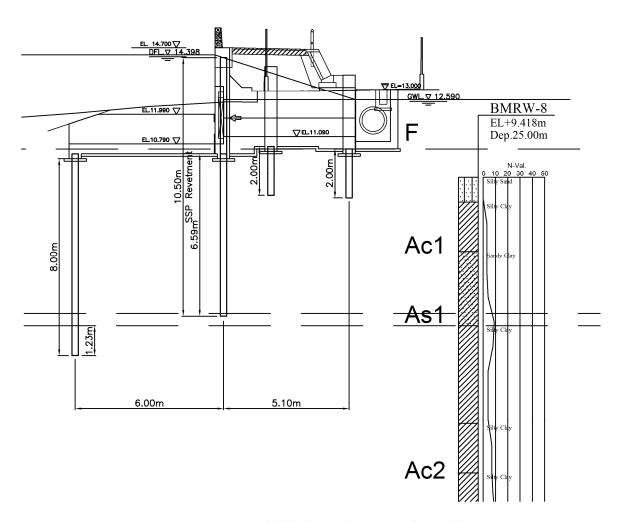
Length of SSP Cut off Wall (9/9) (MSR-4)
